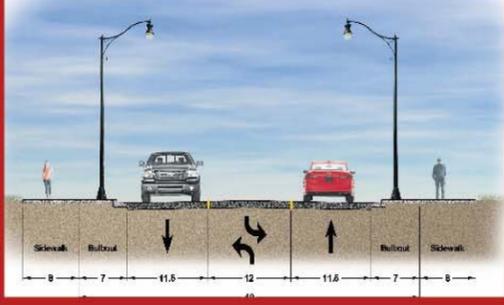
SUMMARY OF SHORT TERM IMPROVEMENT PLAN
